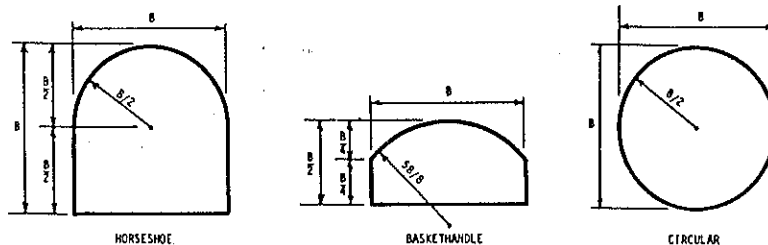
Alternative tunnel shapes for drill-and-blast excavation.
